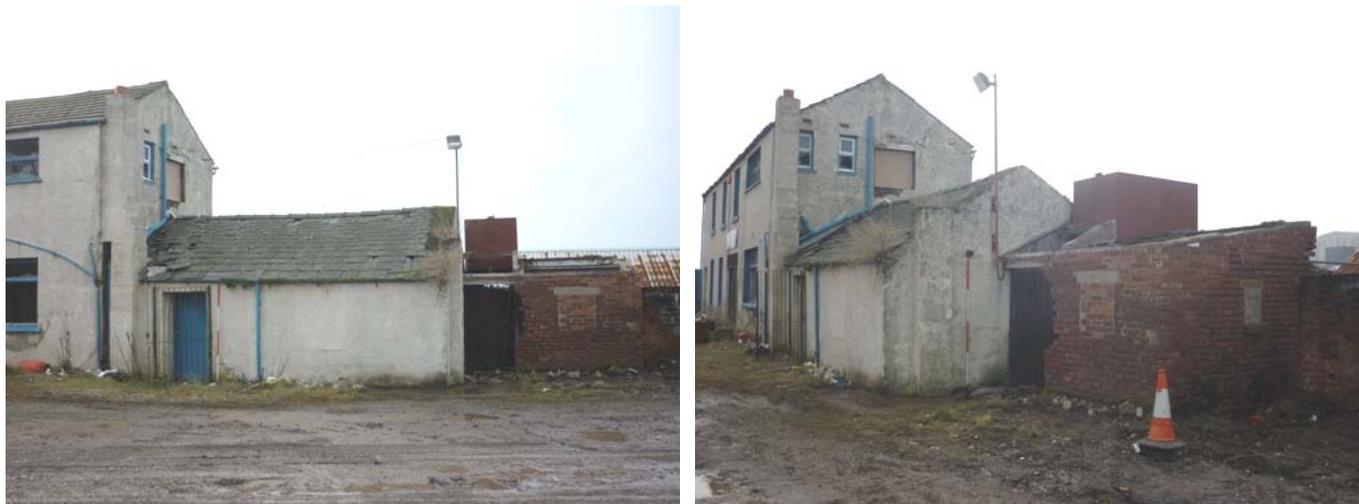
(left): Building 2, east external elevation, viewed from the east
